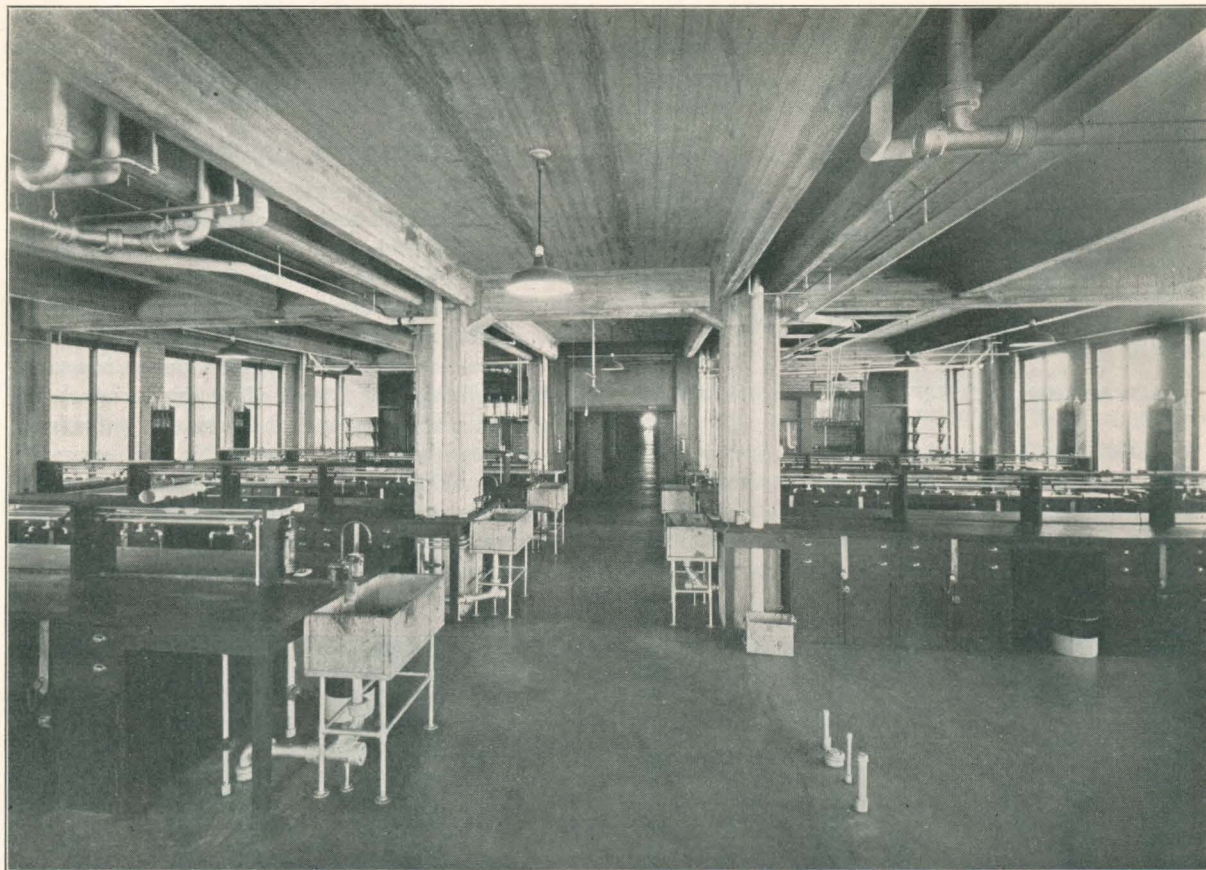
STUDENTS' LABORATORY, SHOWING DETAILS OF LOCKER ARRANGEMENT, SHELVING, SUPPLY PIPING, DRAINAGE, AND WASH-UP SINKS
